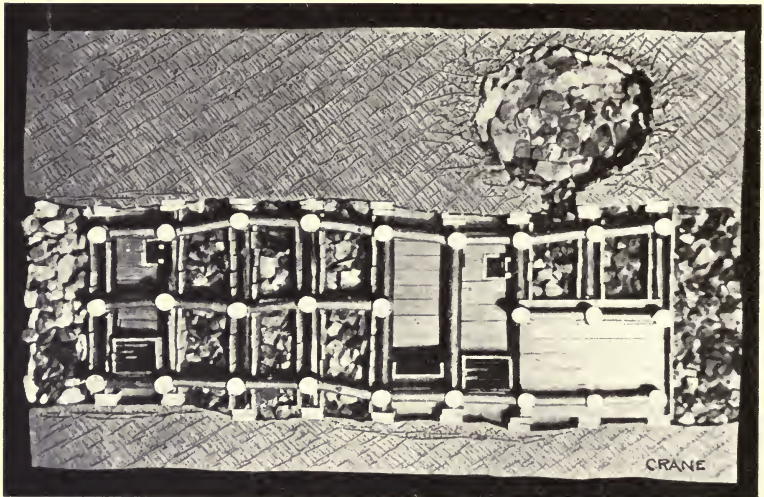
Plan of Second Floor of Stull-Set Method.
